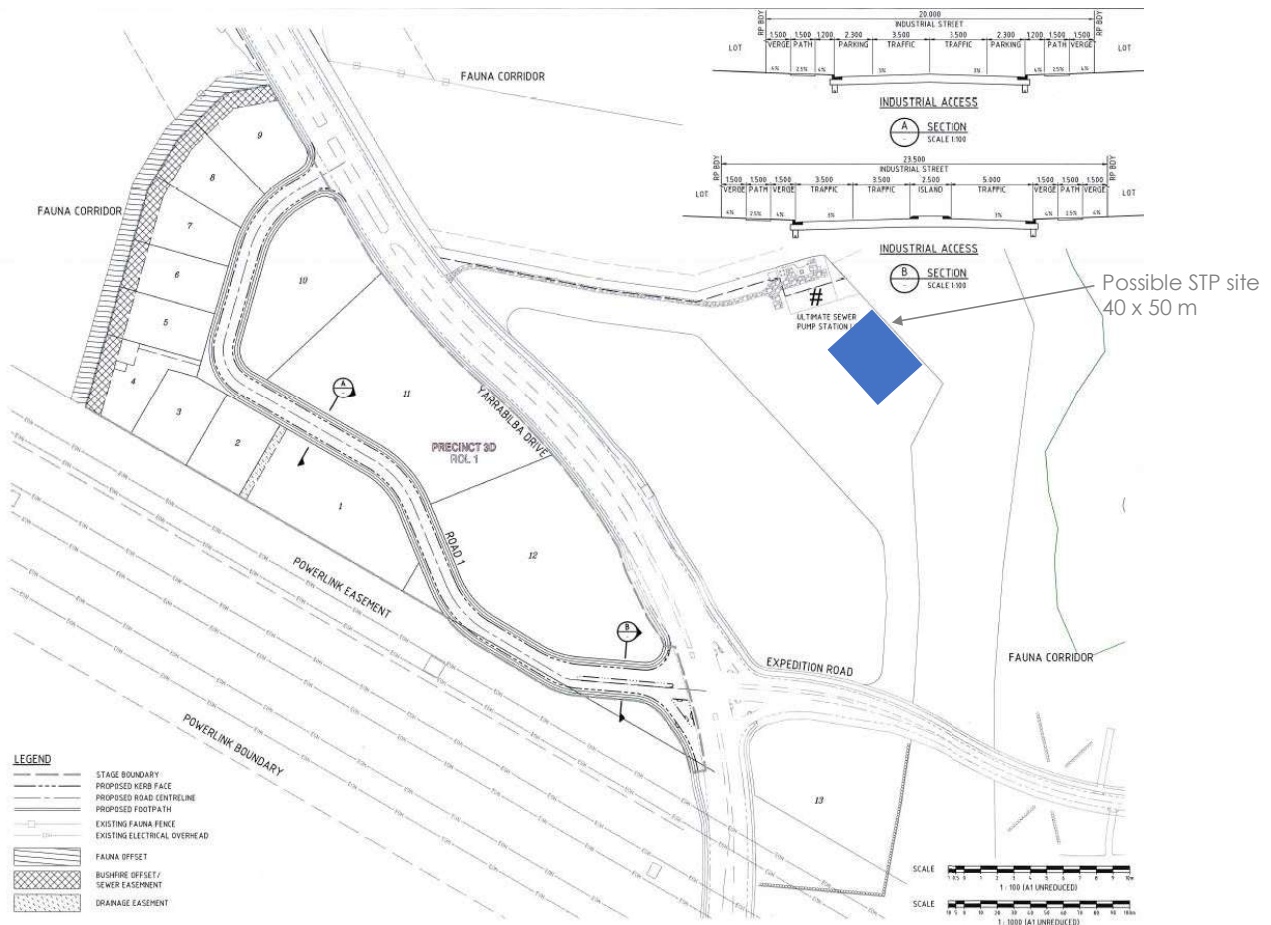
Proposed Precinct 3D Development Layout (showing ROL, pumping station and possible STP site)
